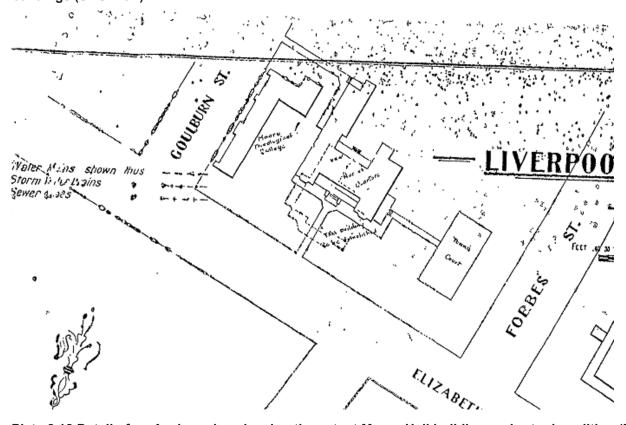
Detail of an Asylum plan showing the extant Moore Hall buildings prior to demolition (PWD Plan SH2/152)
